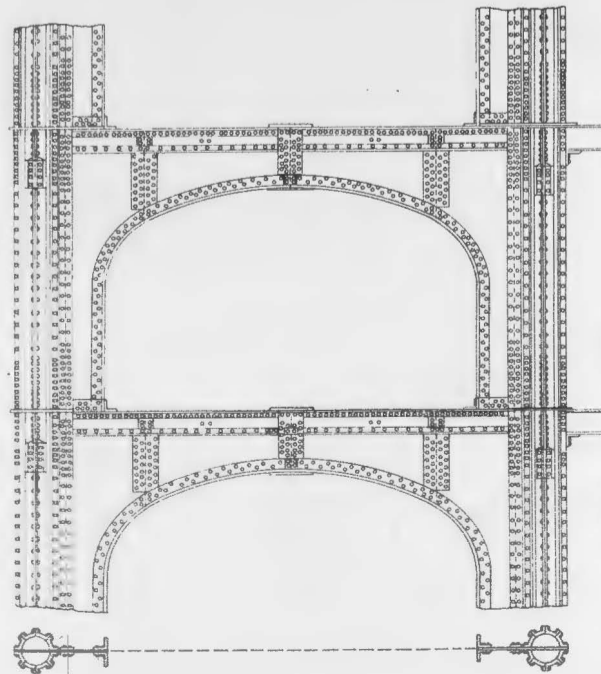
Cross Section of 17 storey Steel Frame Bldg. 1894
